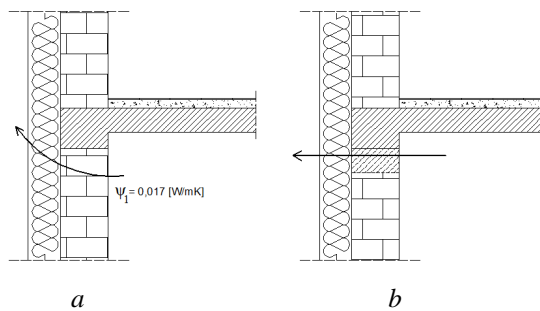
a* – Typical thermal bridge; *b* – Modified geometry of the thermal bridge.
